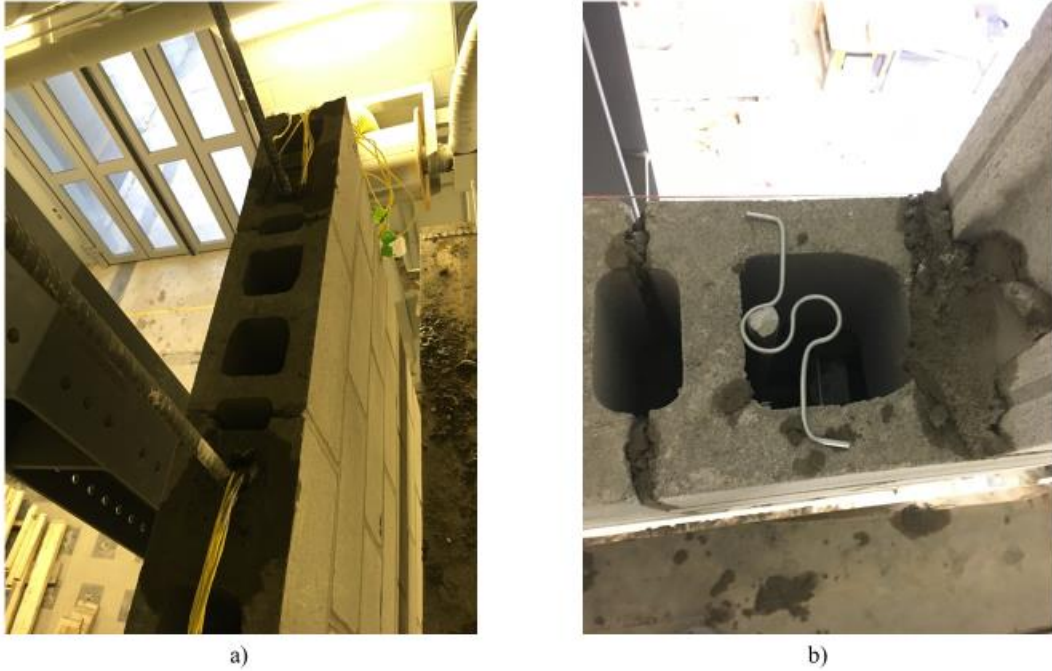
Conventional reinforcement: a) grouting of second stage of construction; and b) bar positioner to align the lap splice with the reinforcement for the third stage
